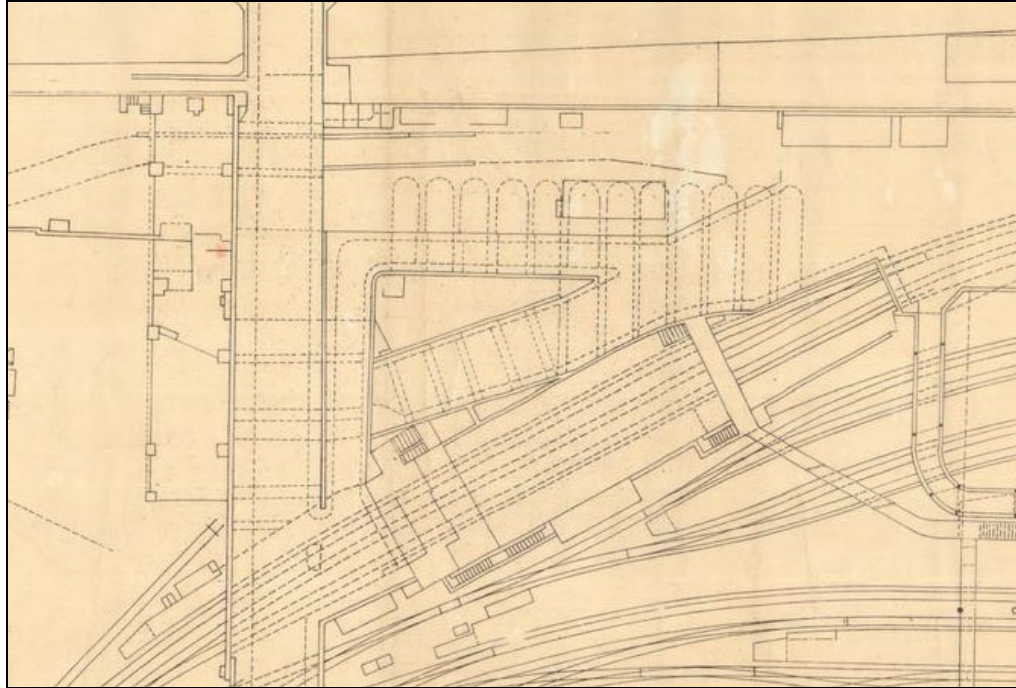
1930 plan just prior to the truncation of vaults and insertion of new ramp orientation
